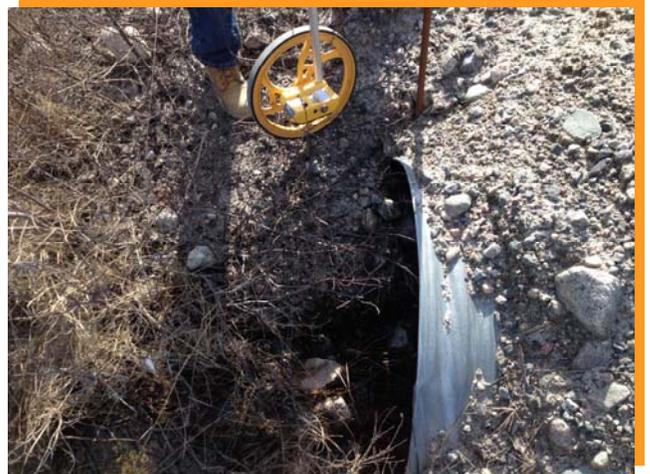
2+300 – TTOG 900 – Entrance to be clean, left 2
